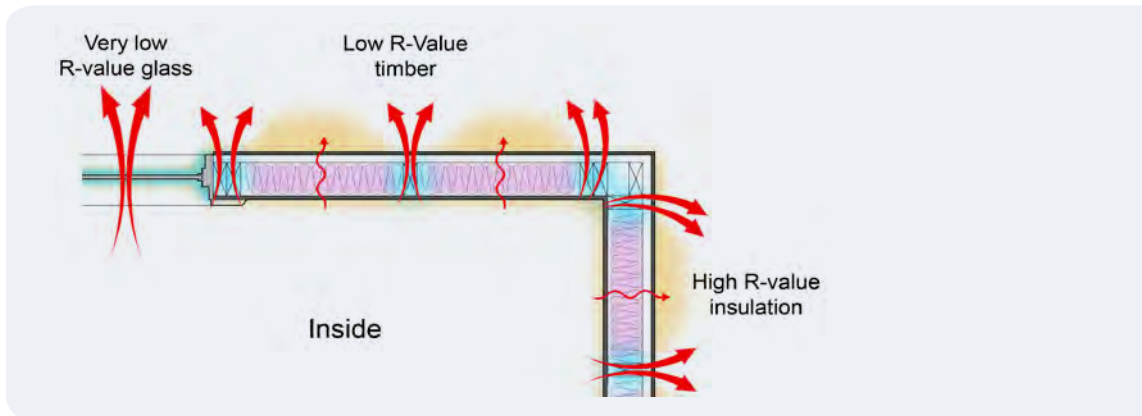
Timber-framed wall. Conventional timber framing with insulated cavities will still give some thermal bridging.
